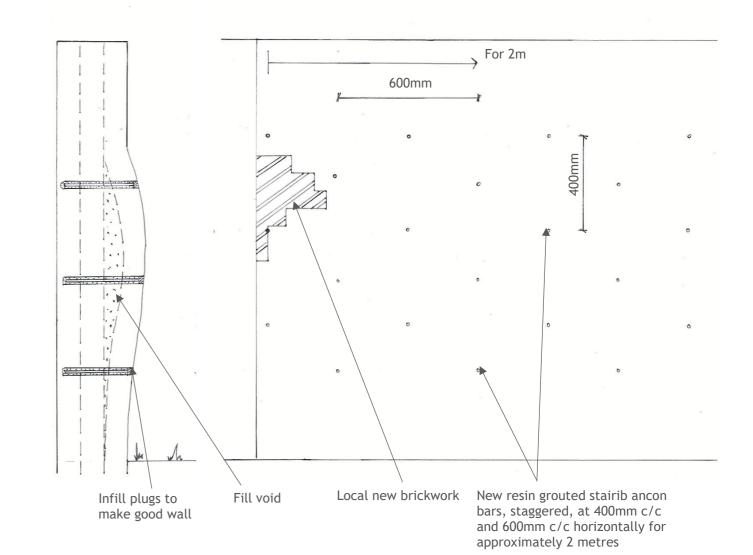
Option 2, local repair of wall, inner skin stabilised with ties and voids filled, Left: Elevation, Right: Section
